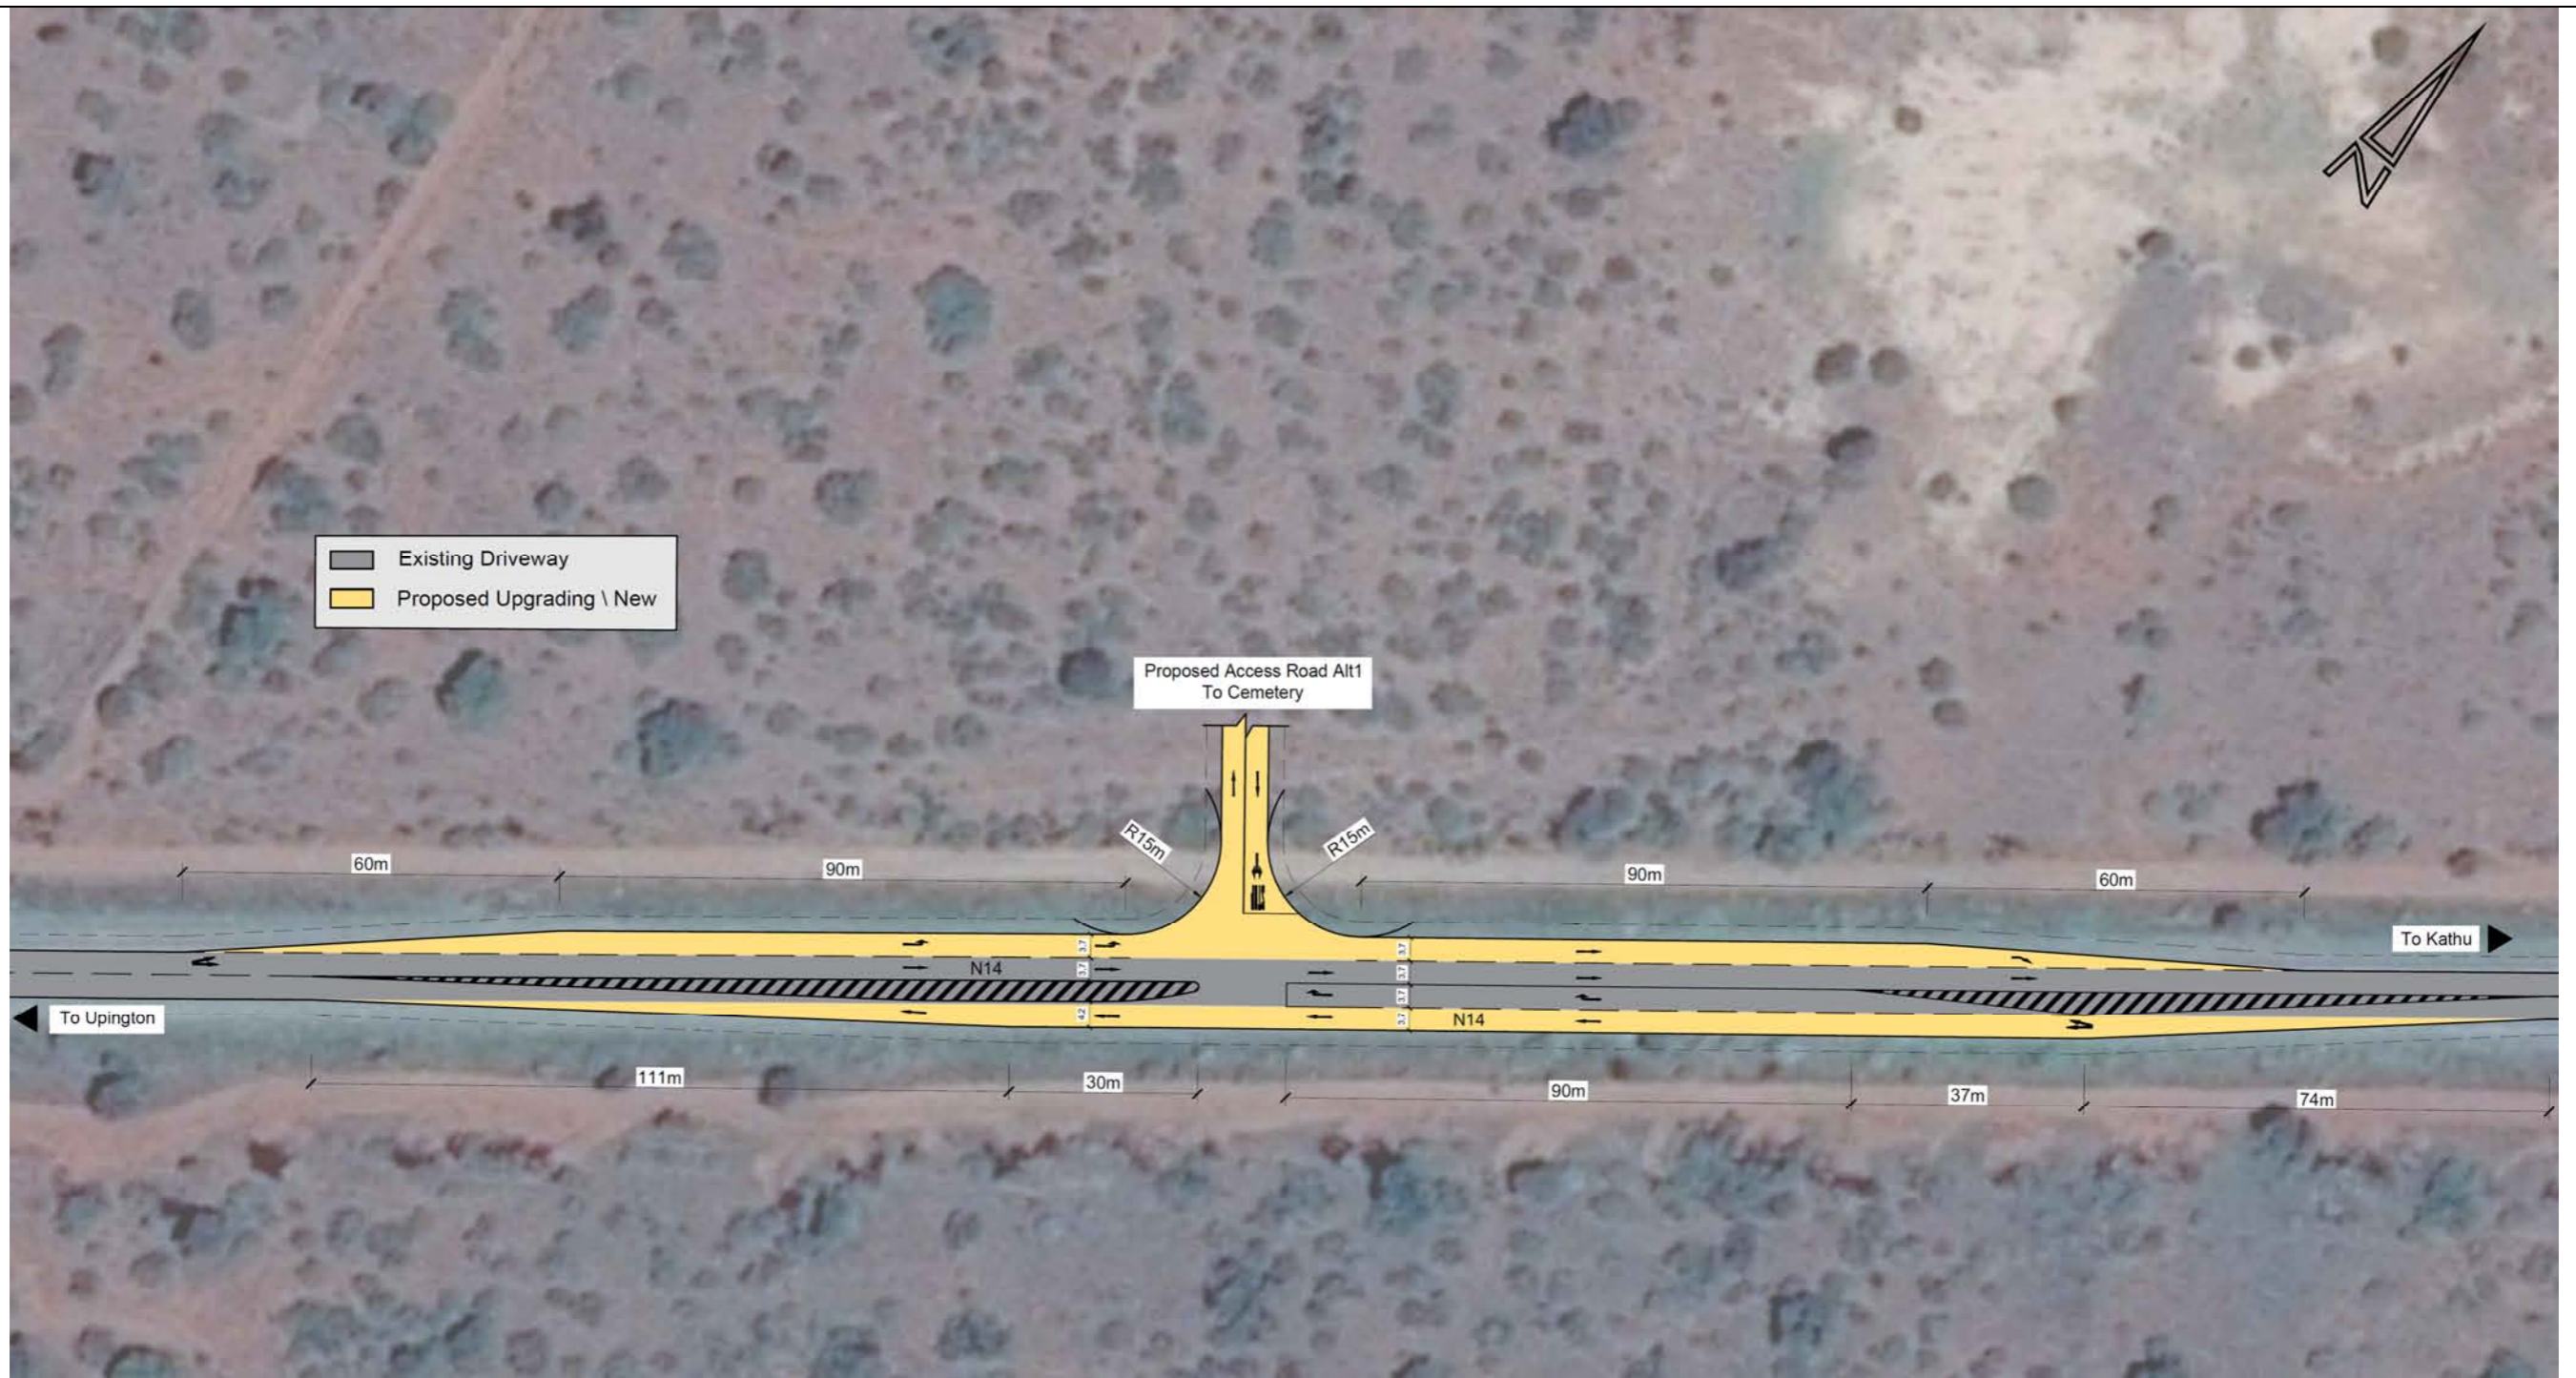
LAYOUT REQUIRED WITH THE PROPOSED DEVELOPMENT SHOULD ACCESS BE GAINED FROM ROAD N14 (ACCESS ALTERNATIVE 1)
